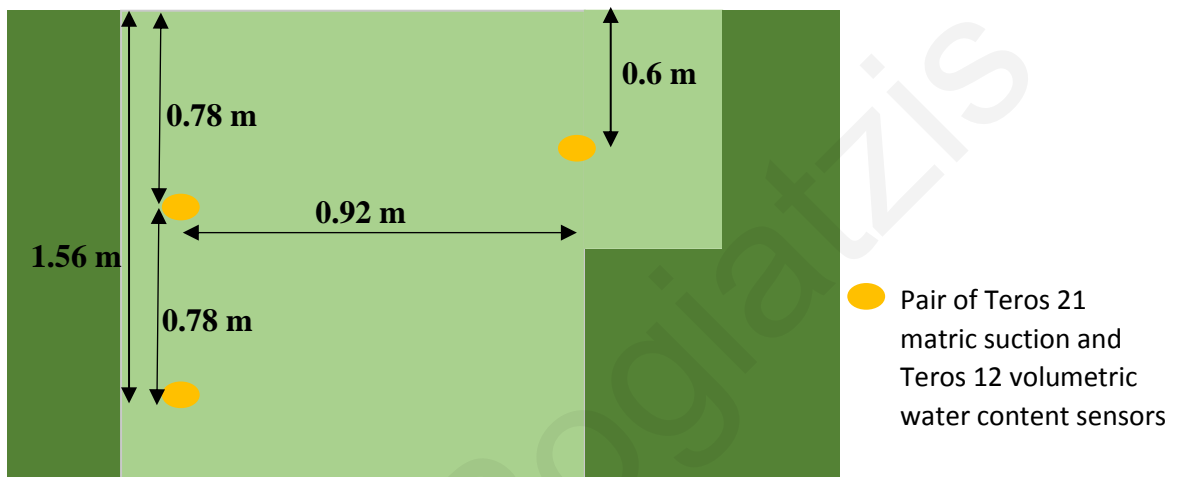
Front view of the excavation side wall showing arrangement of the sensors of the ground monitoring station at Site 3.
